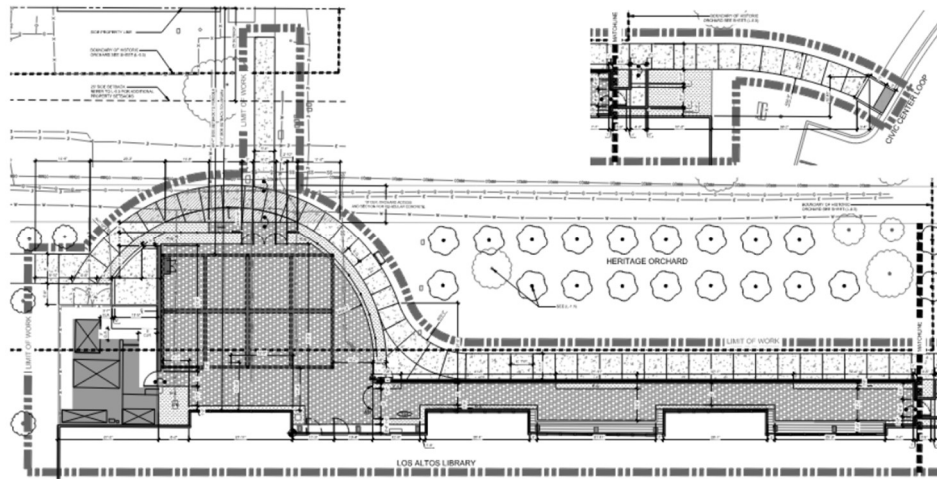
Site plan of the proposed work, revised drawings dated 12/10/2024 (SSA Landscape Architects).
